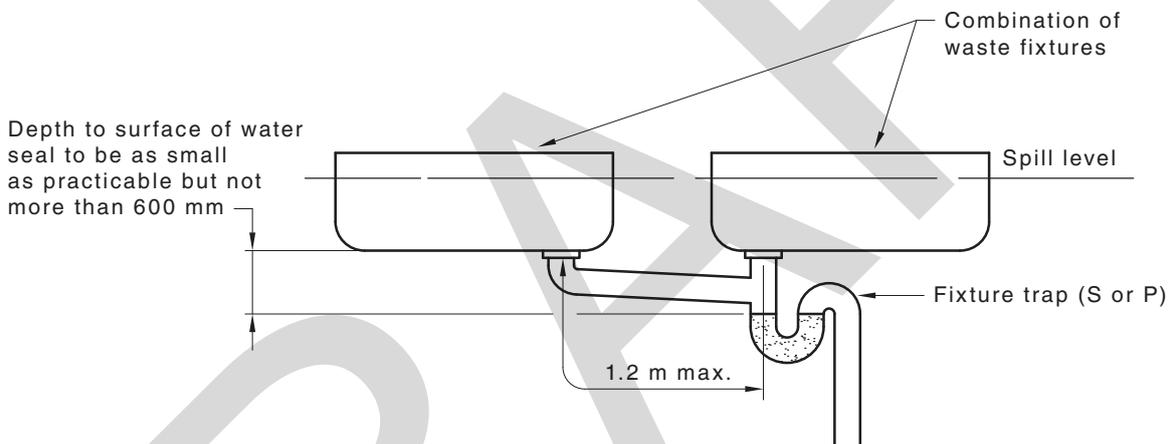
TYPICAL CONNECTION OF A FIXTURE PAIR
